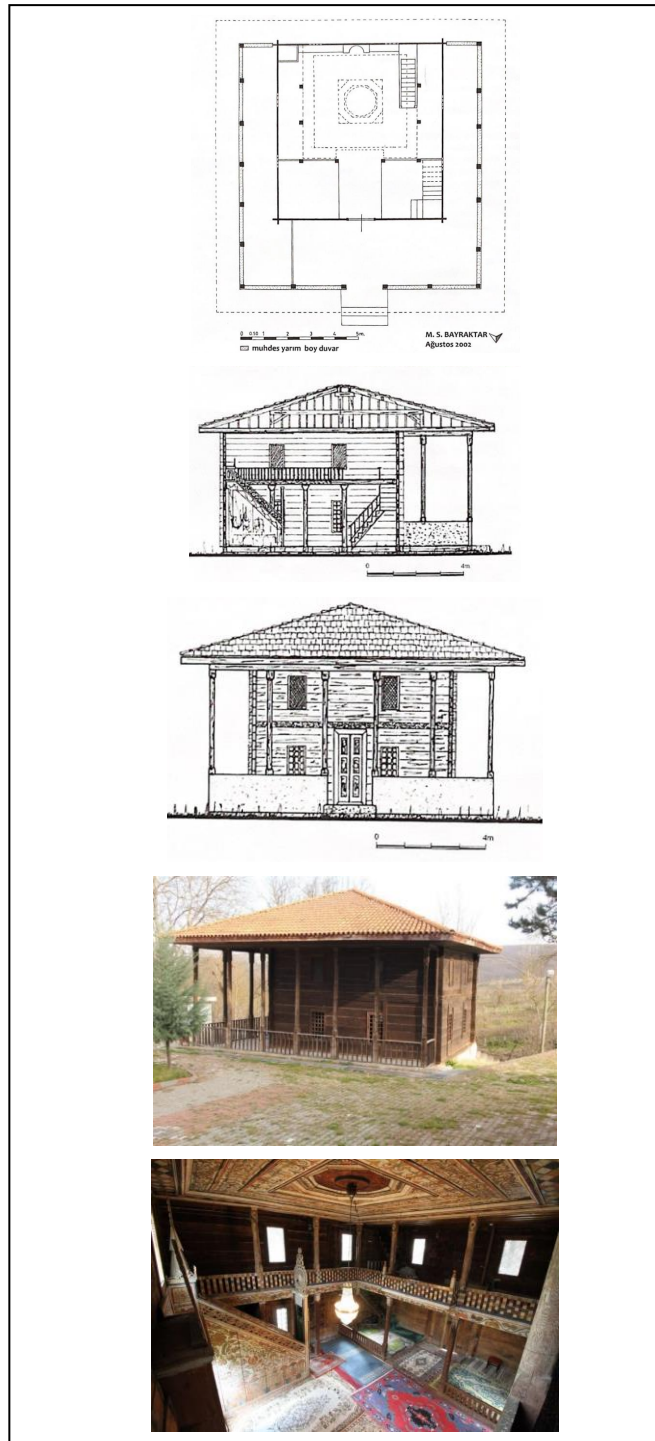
Bekdemir Mosque plan, section and view [2] [24]
